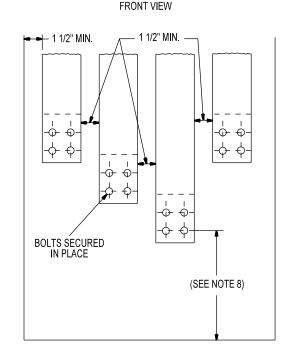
SPACING REQUIREMENTS FOR TOP TO BOTTOM STAGGER OF TERMINATING FACILITIES
